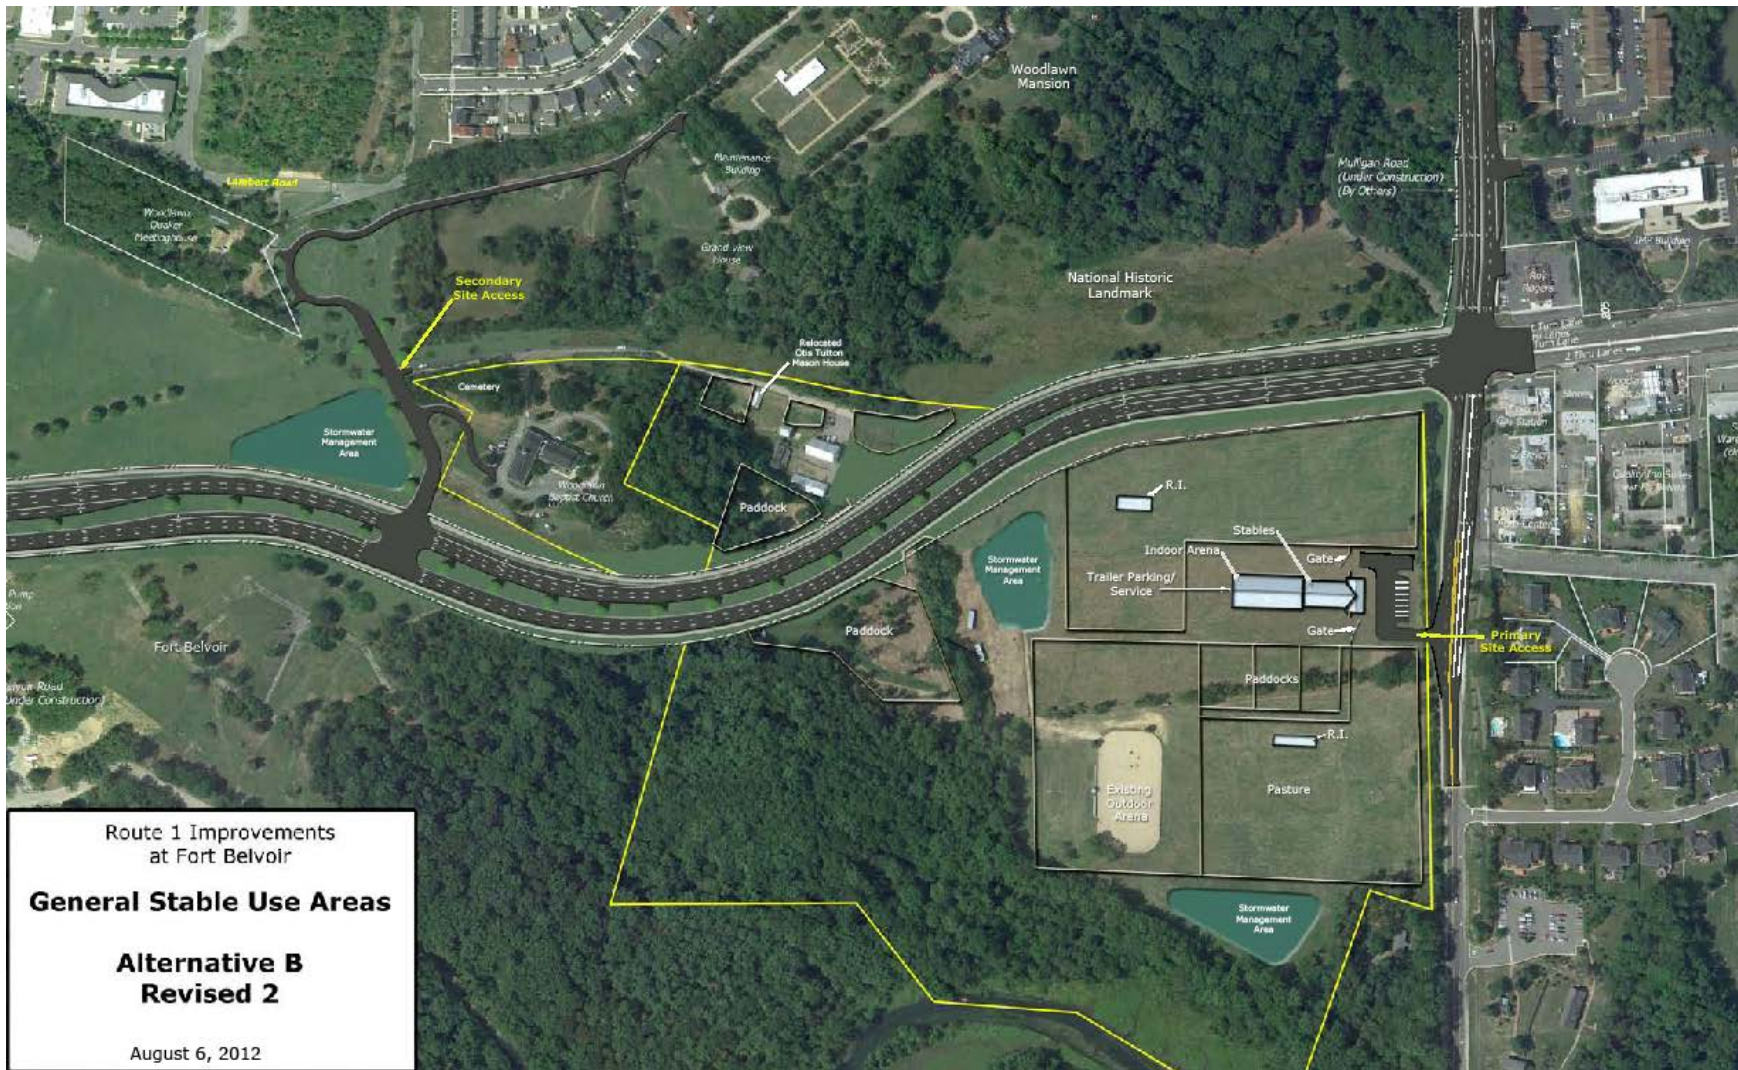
Conceptual Proposal for Redevelopment of General Stable Use Areas
